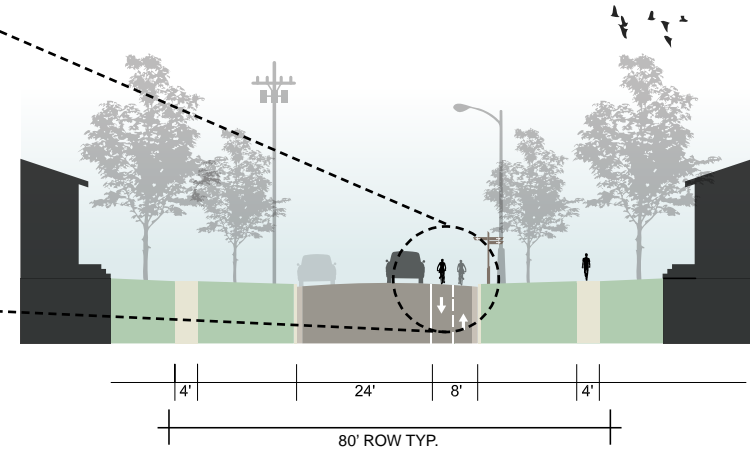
Proposed Two-Way Cycle Track on south side of Broad Street
